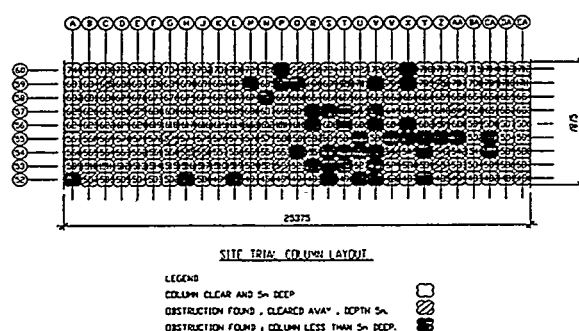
Plan of trial area : Column layout with obstructed columns
